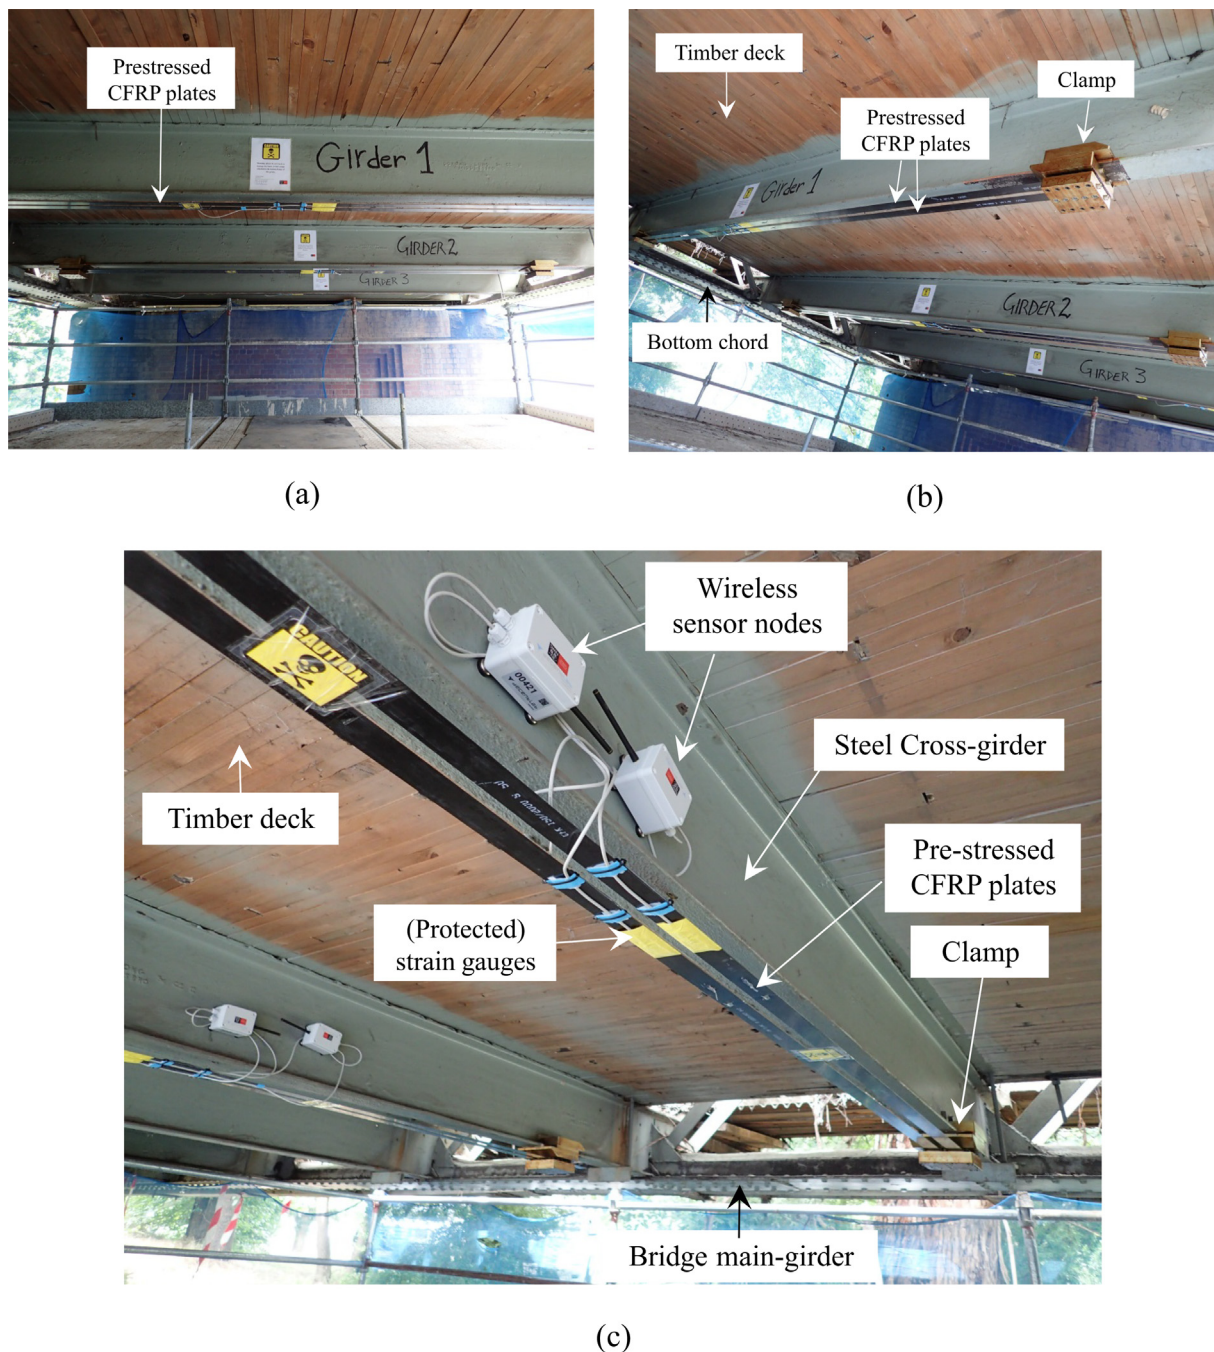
(a) Bridge cross-girders after strengthening, (b) mechanical clamps and prestressed CFRP laminates, (c) different elements of the strengthening and monitoring system installed on the bridge girders. The strain gauges were protected against humidity for the long-term outdoor applications.
